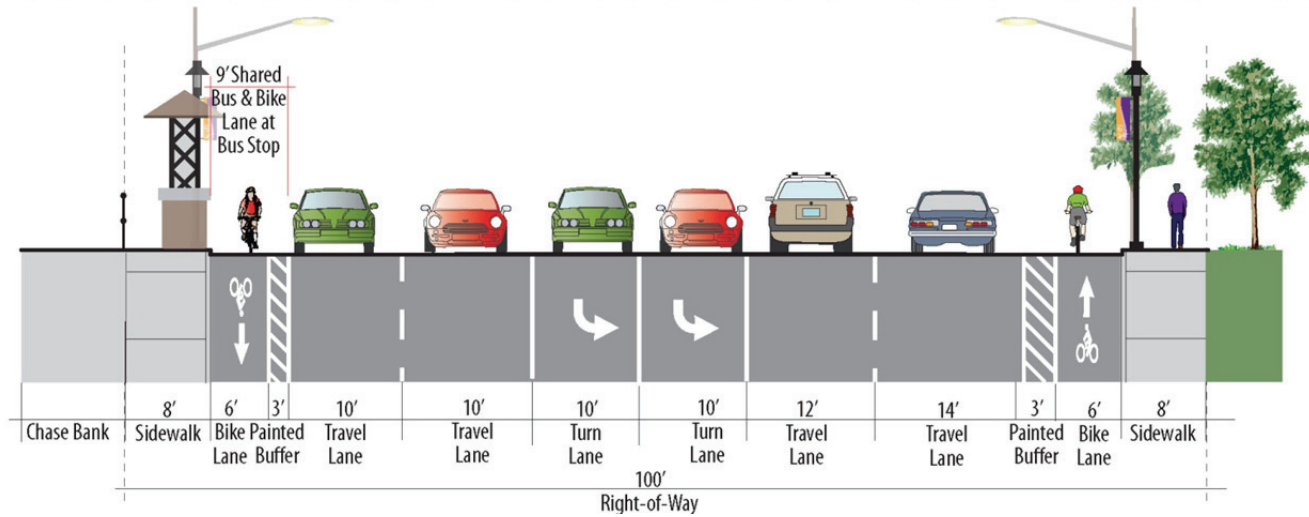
Proposed Bikeway Improvements, Section E – Thousand Oaks Boulevard
